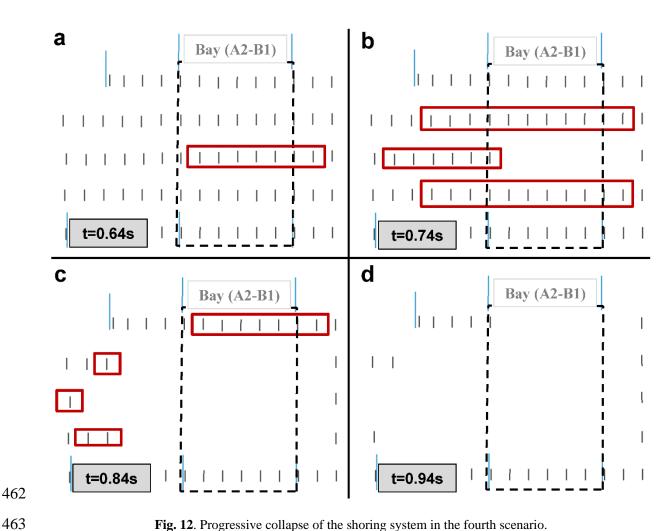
Progressive collapse of the shoring system in the fourth scenario.
